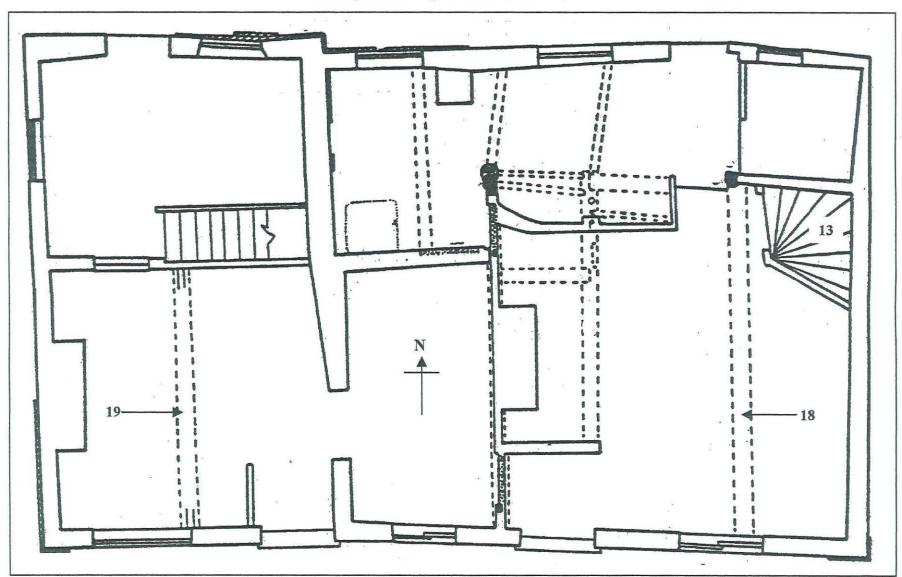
Plan at ground-floor level to show timbers sampled (not all sampled timbers shown)
